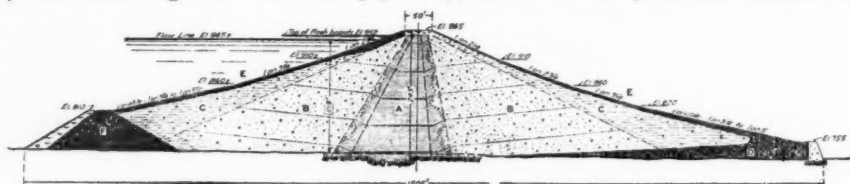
ACTUAL DEVELOPED SECTION OF DAM
